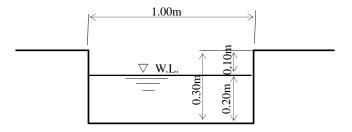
Section of Intake Inlet of Connecting Canal
